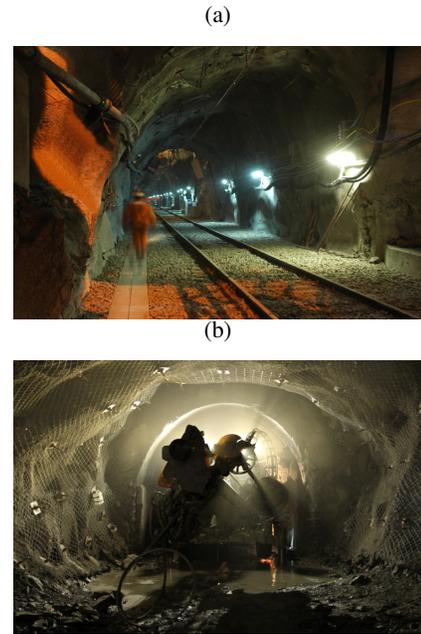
El Teniente underground mine light deployment (a) Transportation tunnel (b) Machinery working inside the tunnel
